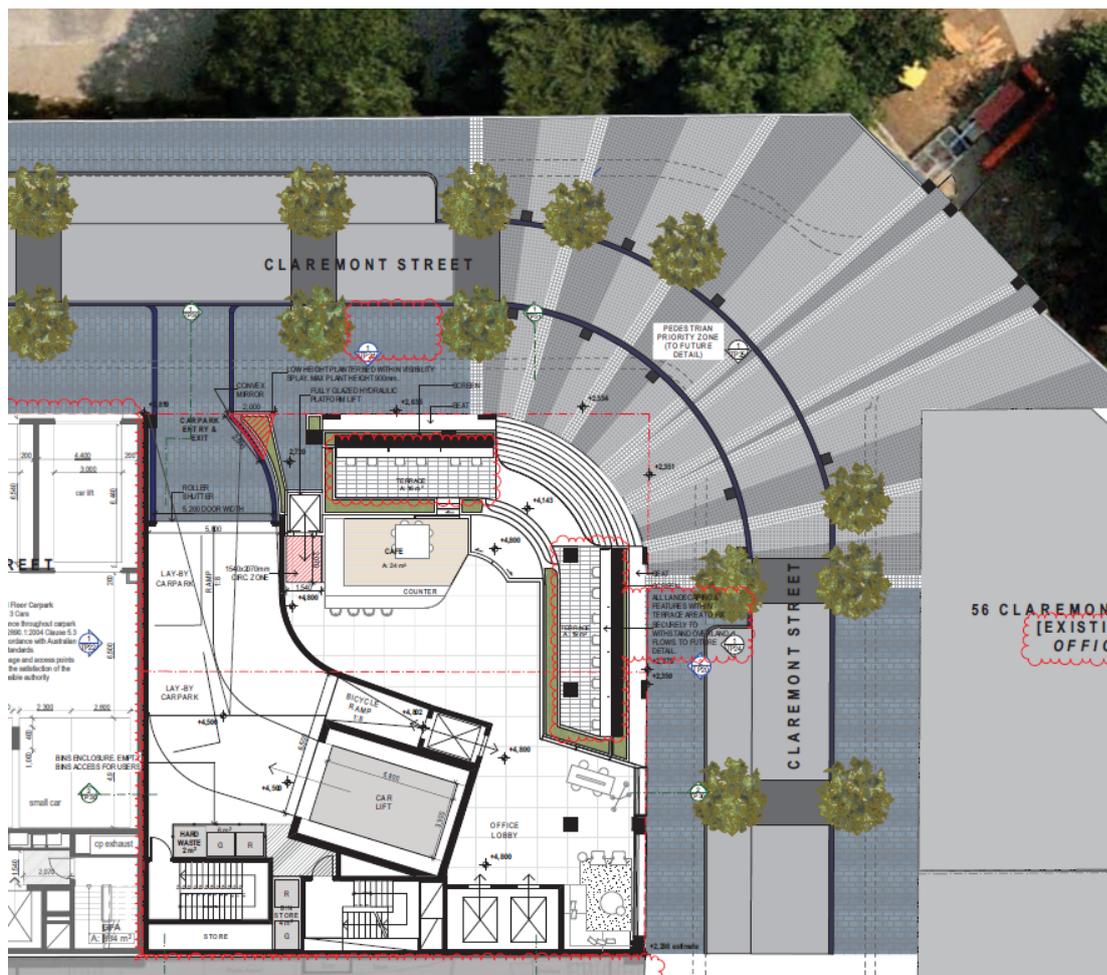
Extract from Level 1 Plan showing indicative streetscape works and pedestrian priority zone
